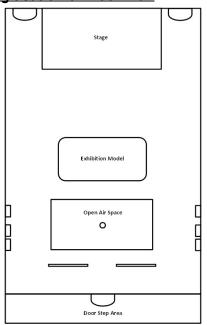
Digitised floor plan of Yueh Hai Ching Temple
